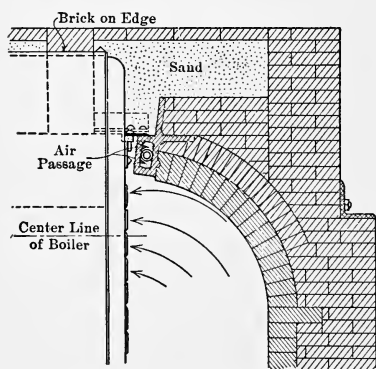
Woolson's Gas Tight Back Arch Connection.
